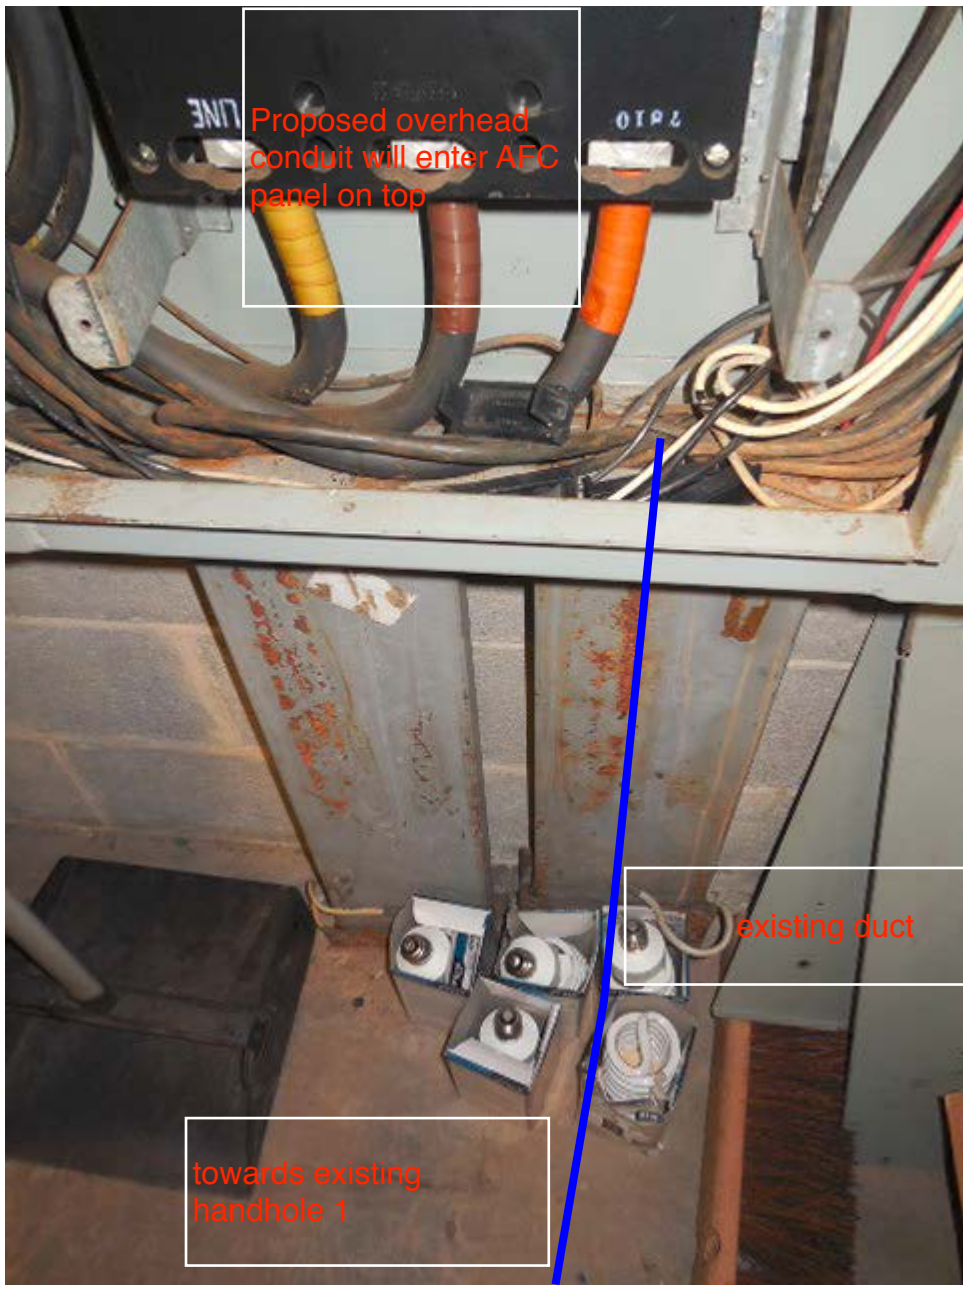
C12 Braddock Road: Existing duct to AFC panel in Room #C111.
